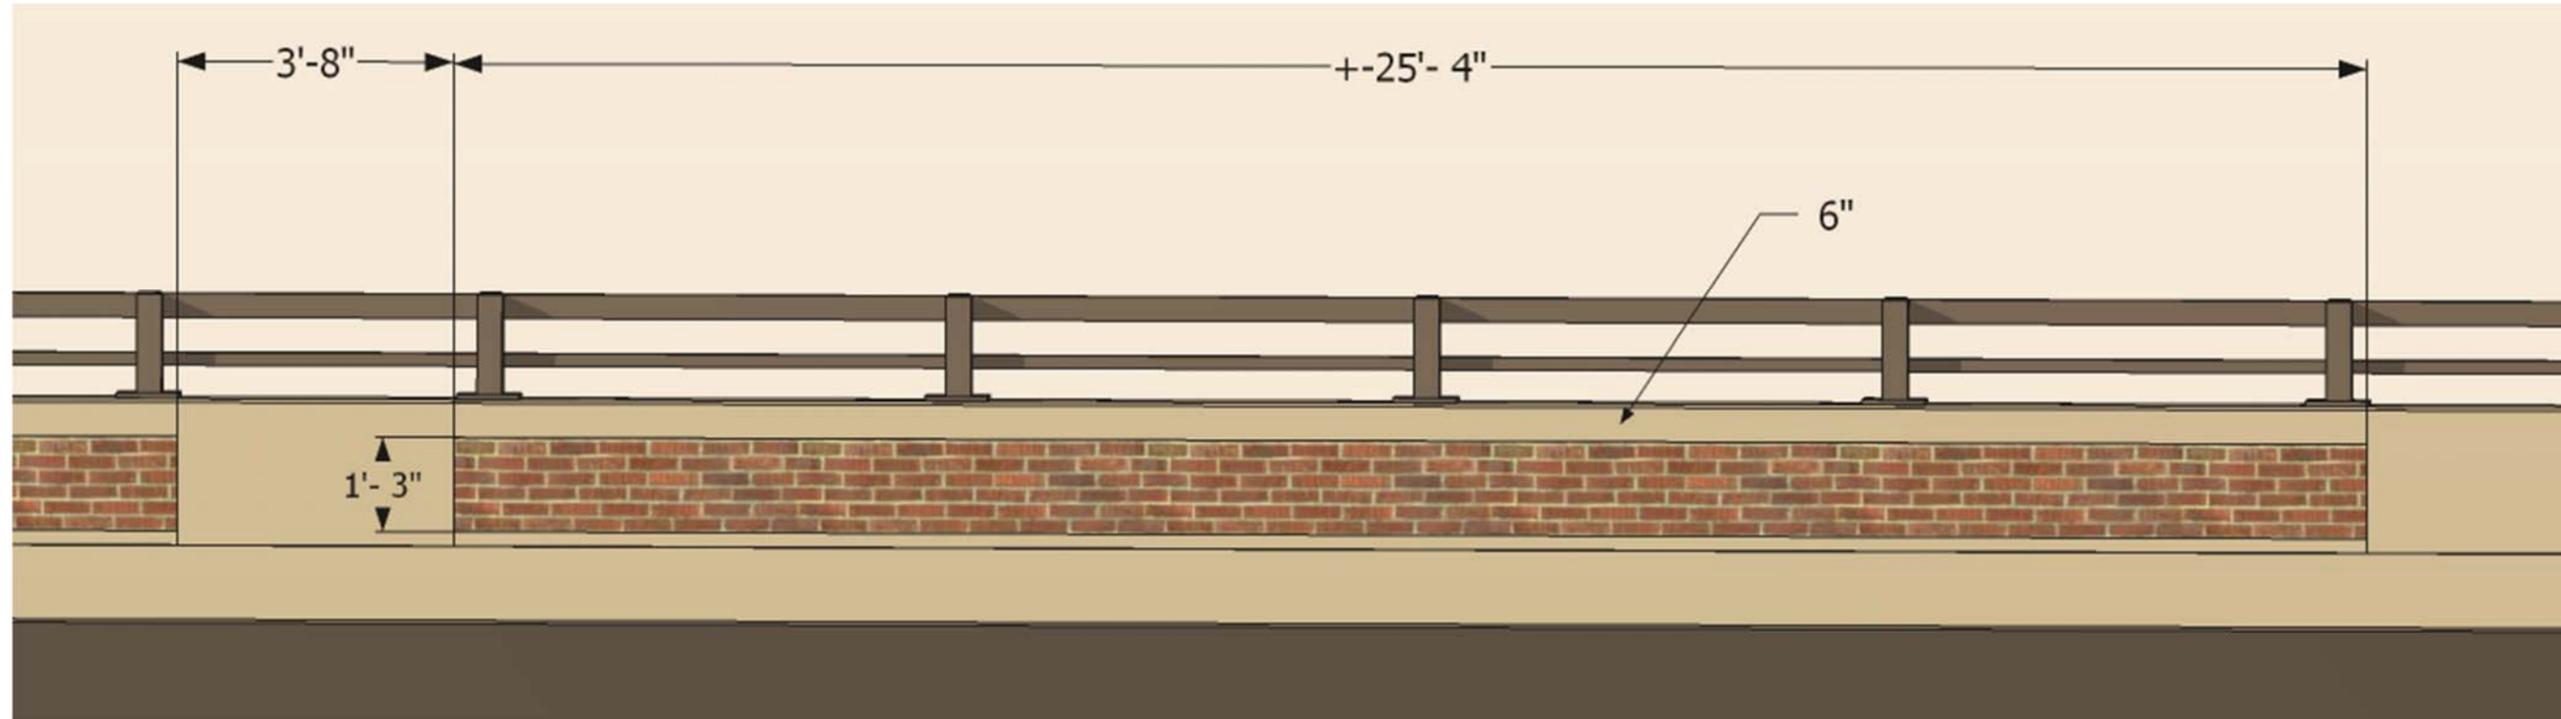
General Aesthetic Dimensions MDOT Modified B-17 or B-20 Bridge Railing
